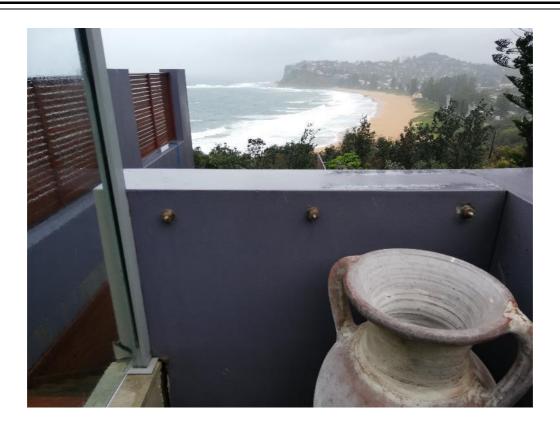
View of Existing Retaining Wall Upturn and Colour to be Matched
